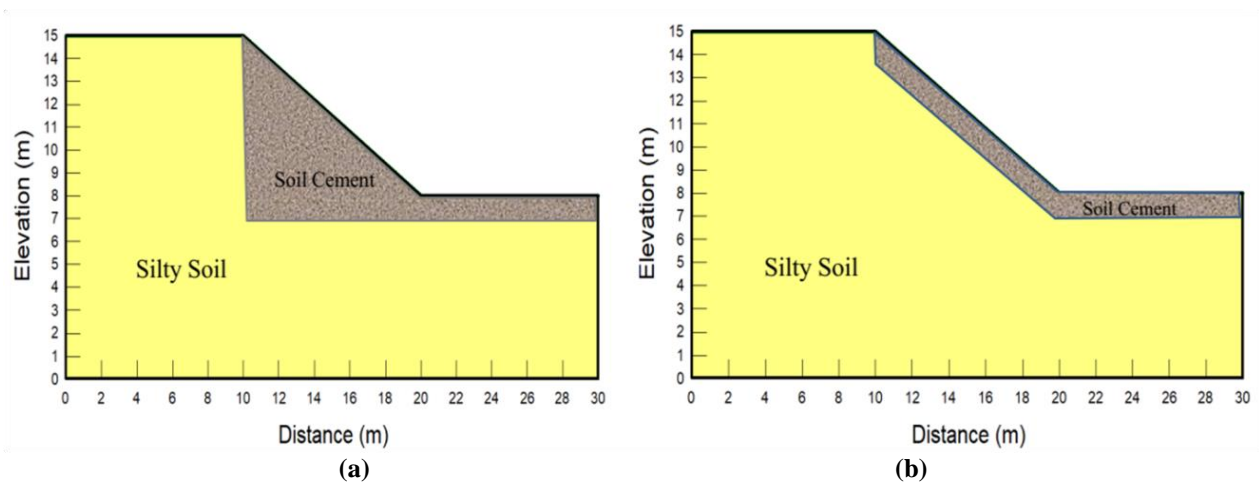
Typical sections of upgraded slopes by (a) Vertical Layering and (b) layering along the slope
